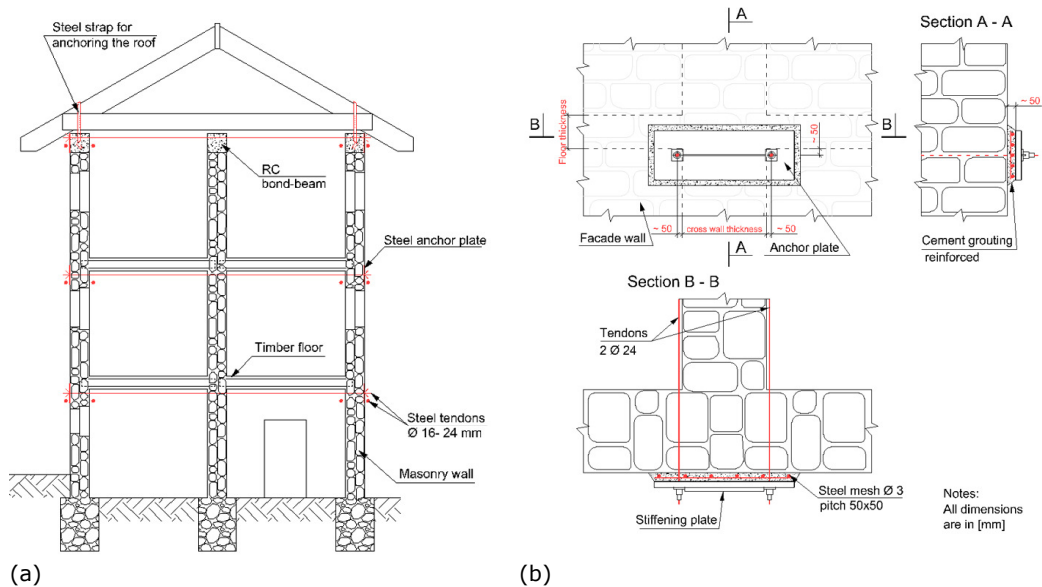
Binding of opposite walls. Layout of the rods (a) and fixing details (b) [101]
